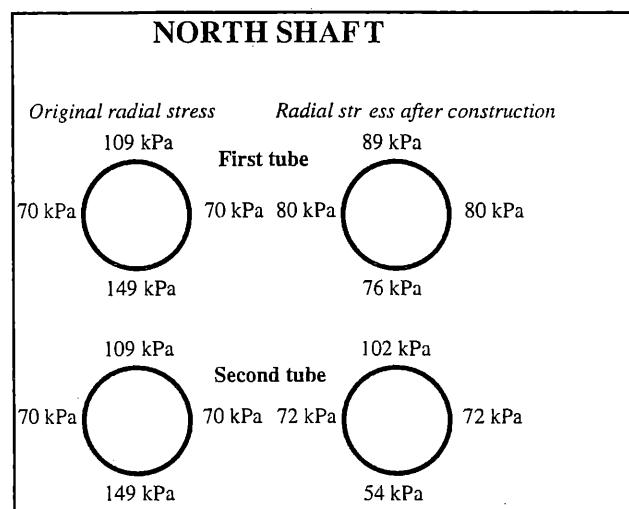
Effective radial soil stresses before and after tunnel installation at northern shaft
